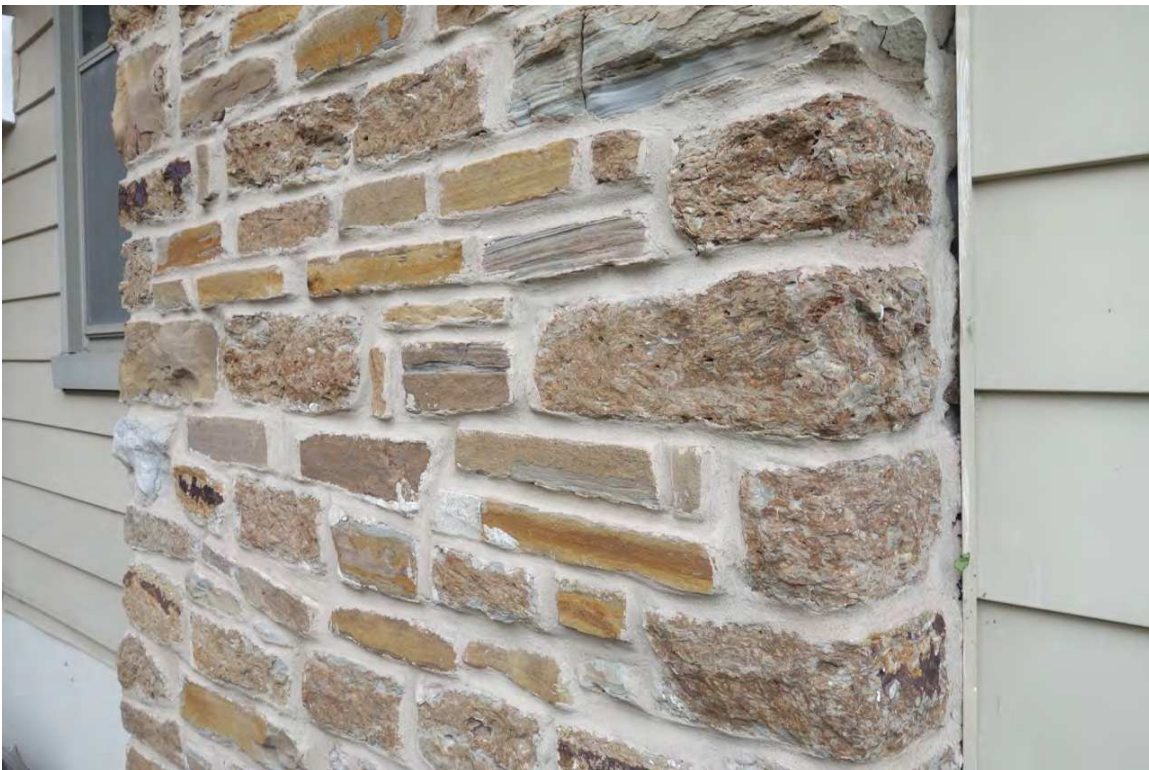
24 Ann Street - EXTERIOR – modern stone veneer on the chimney on the south elevation
